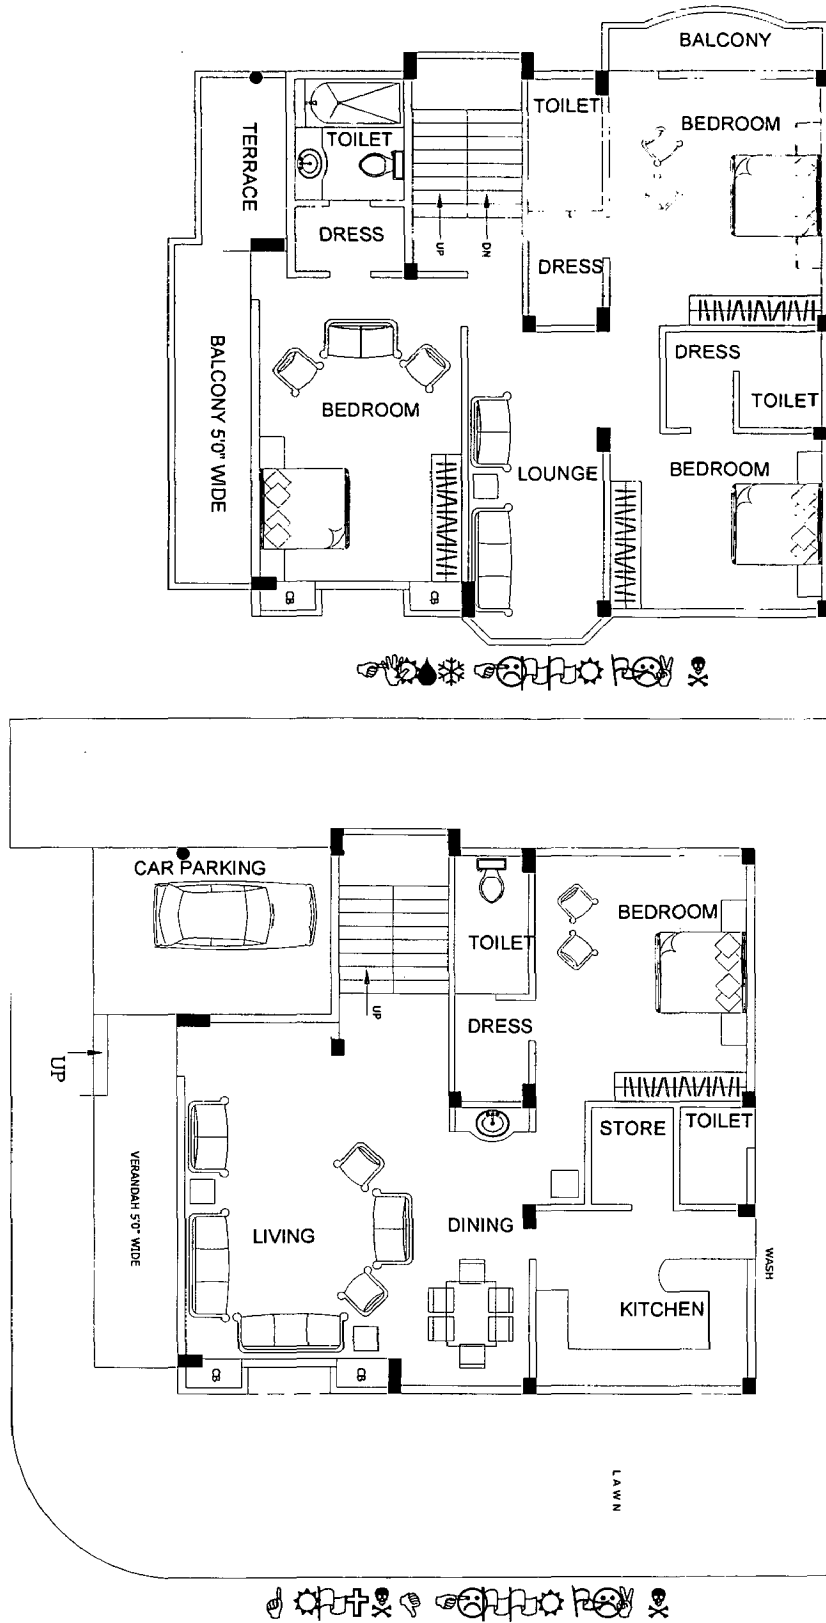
FLOOR PLANS OF CASE STUDY 4
